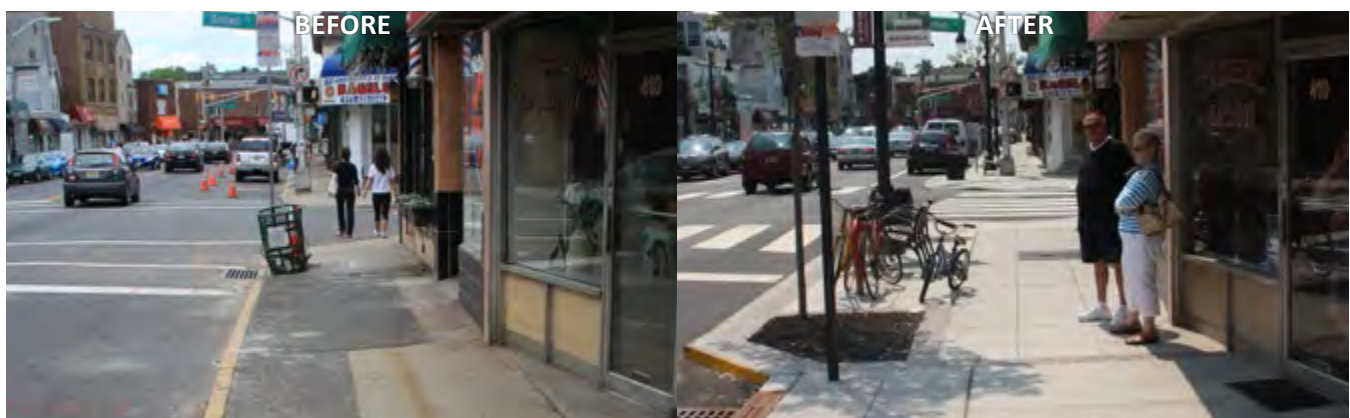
The positive impact of a sidewalk widening and curb extensions shown in Bloomfield, NJ.
